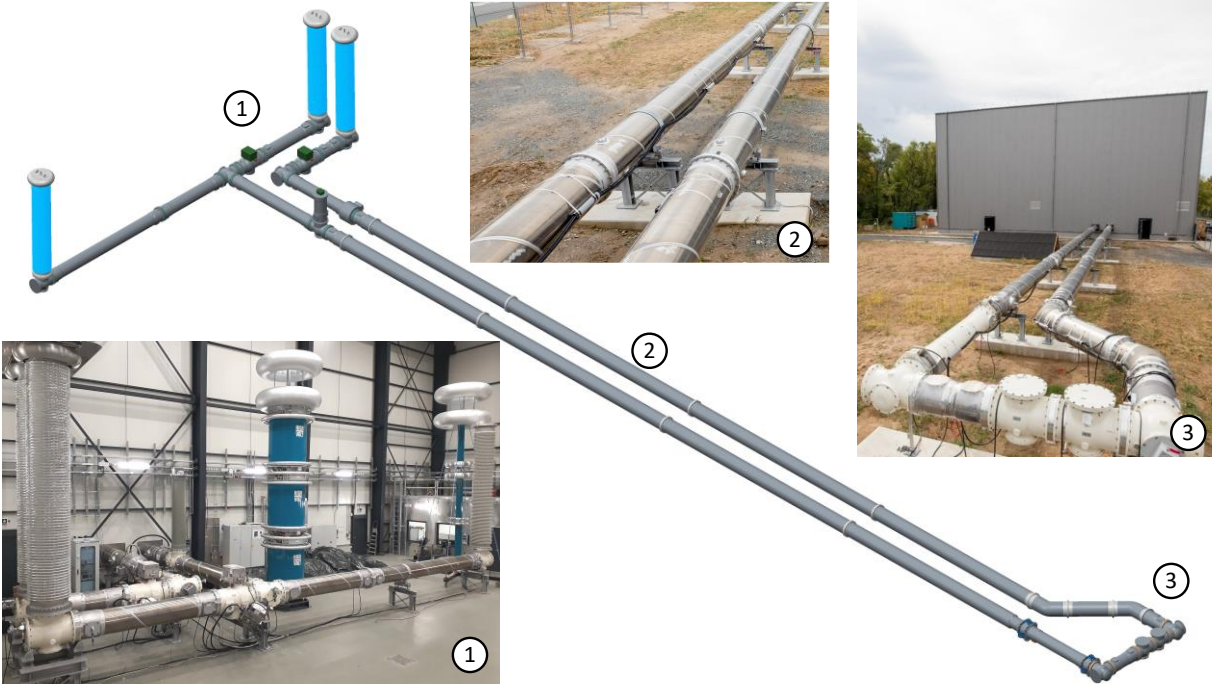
HVDC hall with dielectric indoor (1) and outdoor (2+3) test assembly (“Installation A” – 100 m)
